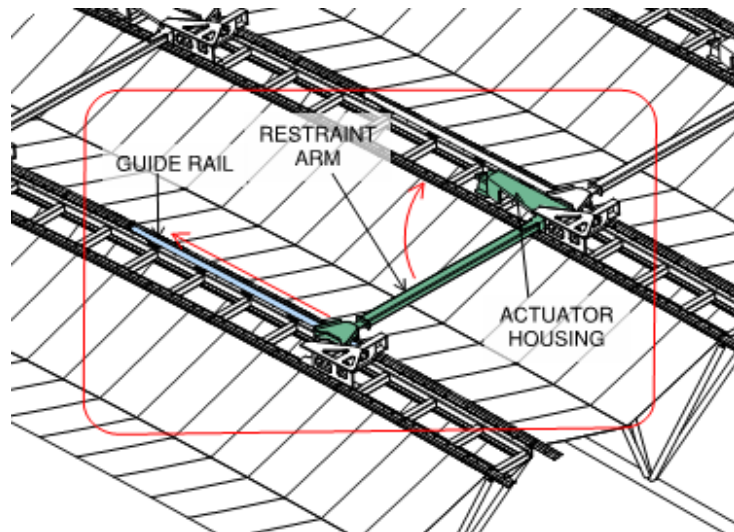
End arm assembly (base image courtesy Tony Hogg Design)
